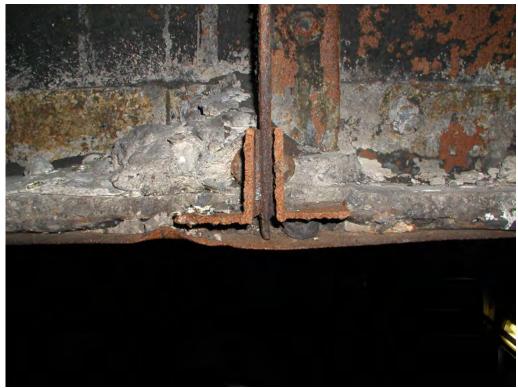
Corrosion Of Girder Connection At Column
